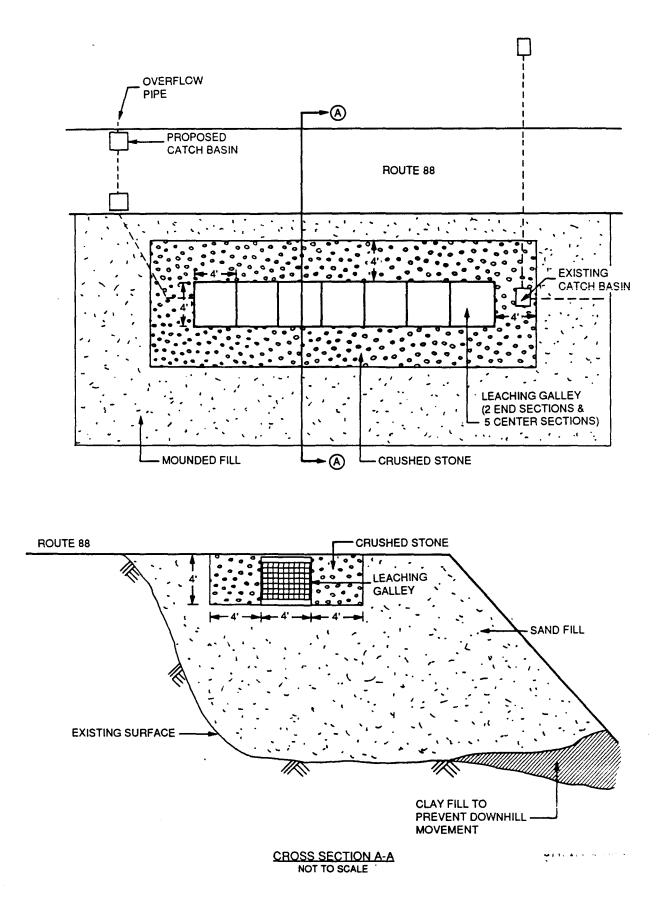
ROUTE 88 - MOUNDED LEACHING GALLEY DETAIL
